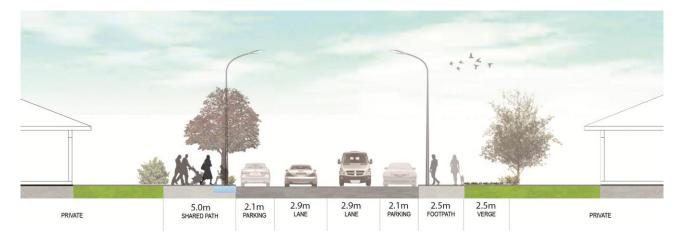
Indicative Milford Road cross section, illustrating boulevard style shared path to west (left) (Note dimensions do not indicate a final design).
